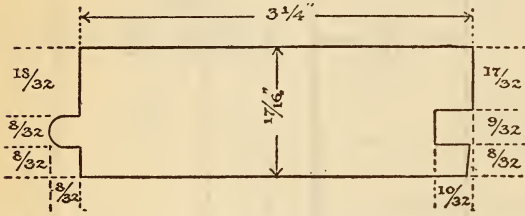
1¼ by 4 inch kiln-dried flooring, green, 3⅜-inch face
